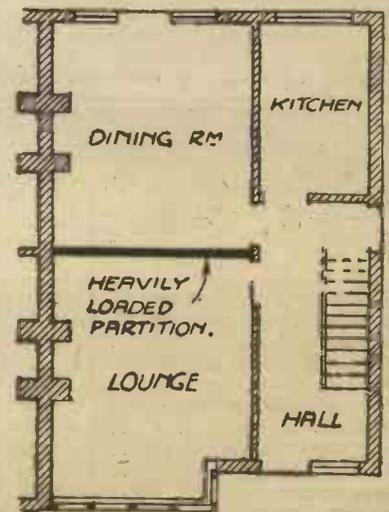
Plan of ground-storey of typical pre-war house with its heavily-loaded partition. First floor joists usually run from front to rear main walls and have intermediate support on partition. (See Fig. 16.)
